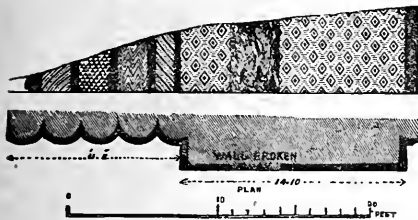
Elevation and Plan of Terra-Cotta Cone wall, Warka.¹
